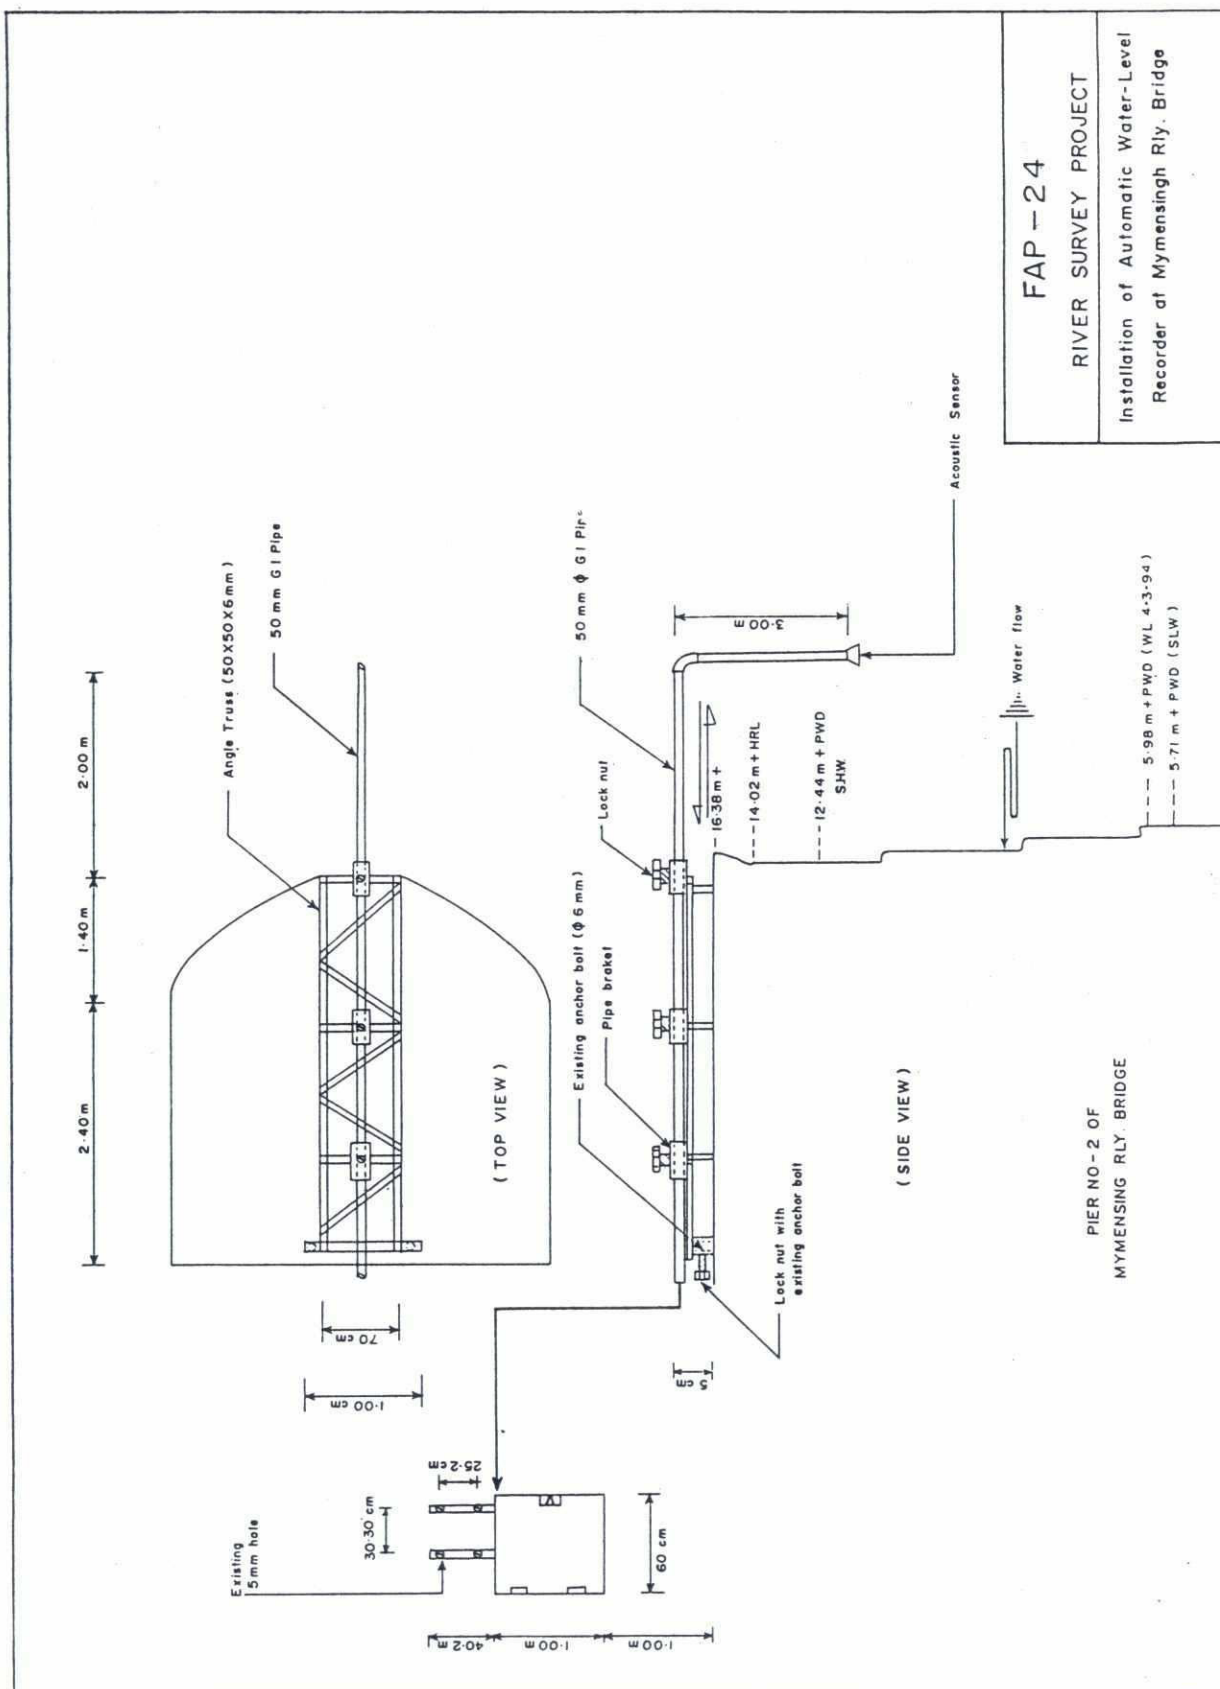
The design elements of the AWLR fixing at the Railway Bridge pier at Mymensingh
